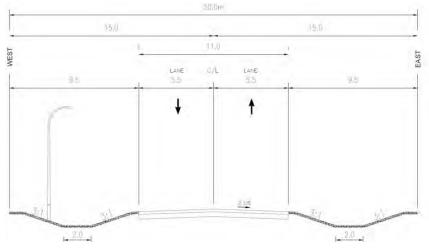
South West Boundary Road Proposed Cross-Section
